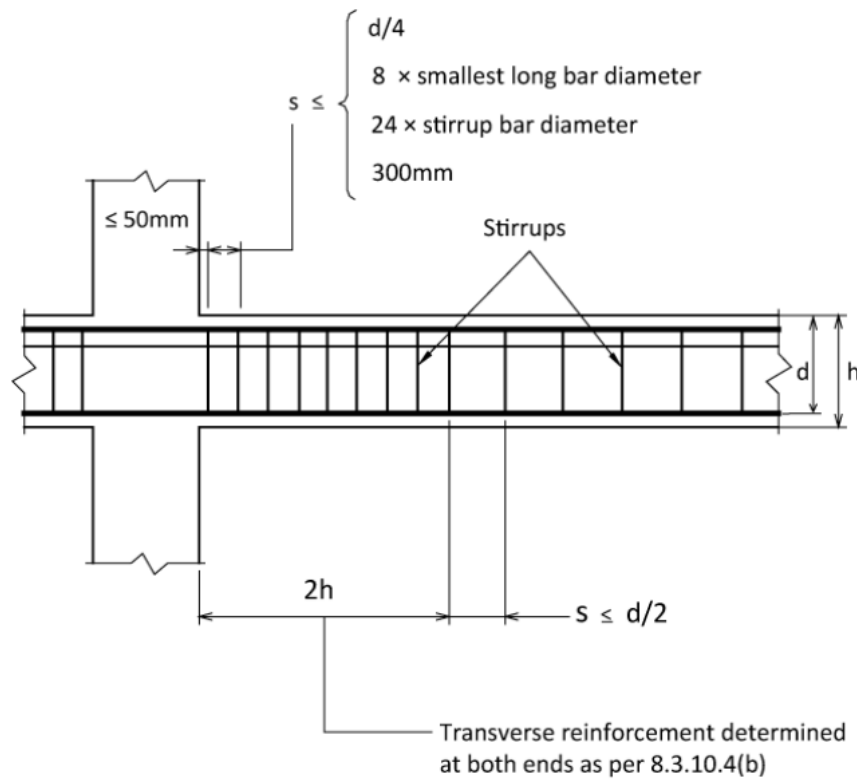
Transverse reinforcement requirements for beams (IMF) (BNBC, 2020)
